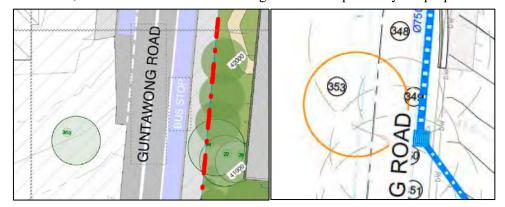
The Tree Retention Plan. (Source: Landscape Plans by Site Image, Issue 3, dated 20/01/2025).
